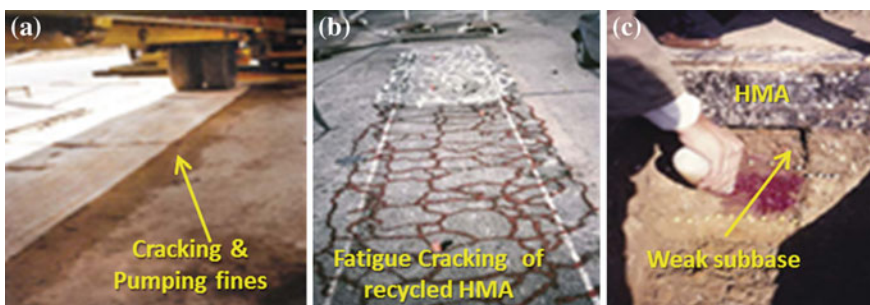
Full scale HVS tests on cemented base pavement (a) and recycled HMA (b) during wet conditions. Note the fatigue cracks (b) and weak upper cementitious subbase layer underneath the recycled HMA shown in c—typical “sandwich” structure
